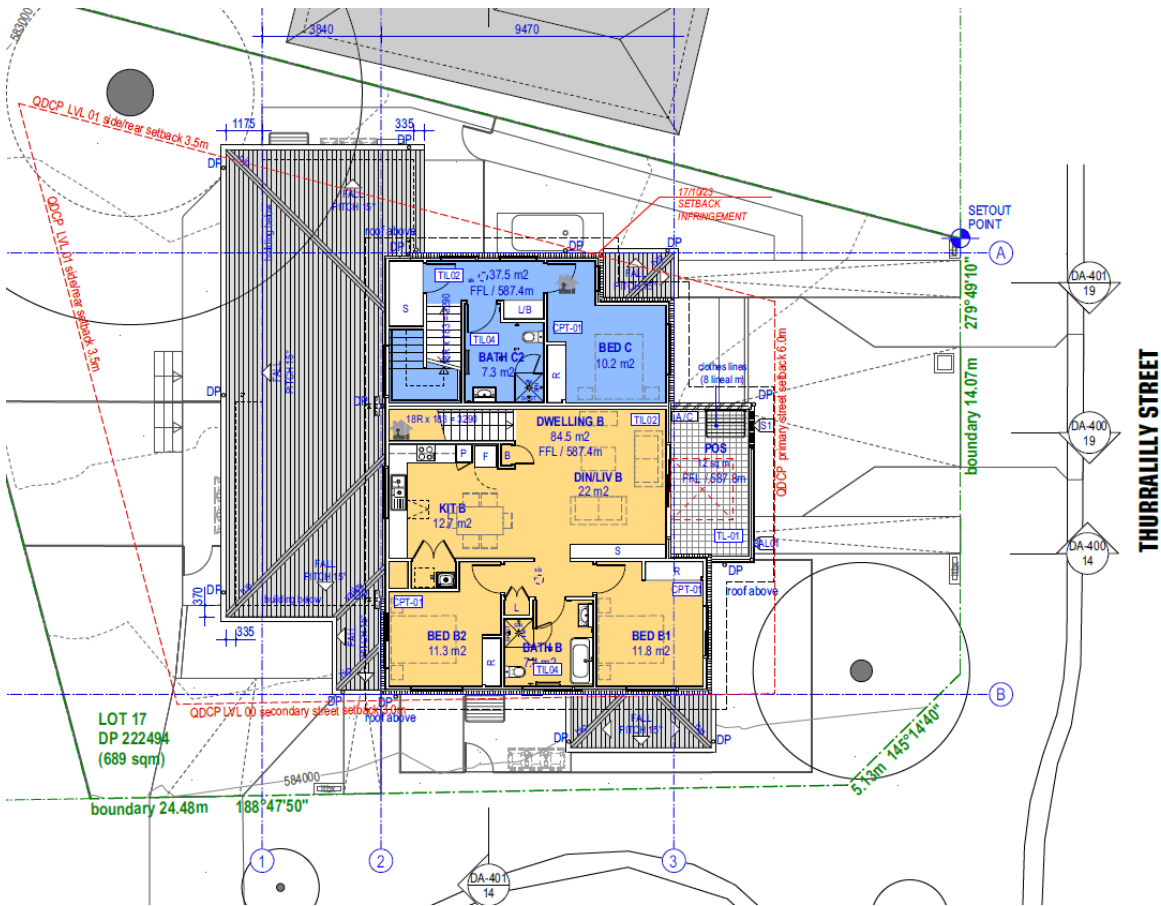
Extract of First floor Plan (Source Kennedy Associates Architects)
